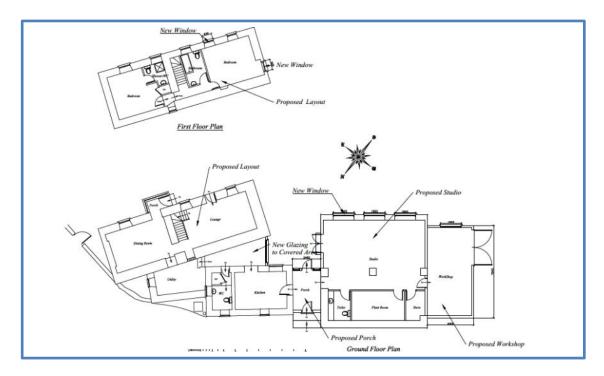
Proposed Site Layout (extracted from submitted plans)
